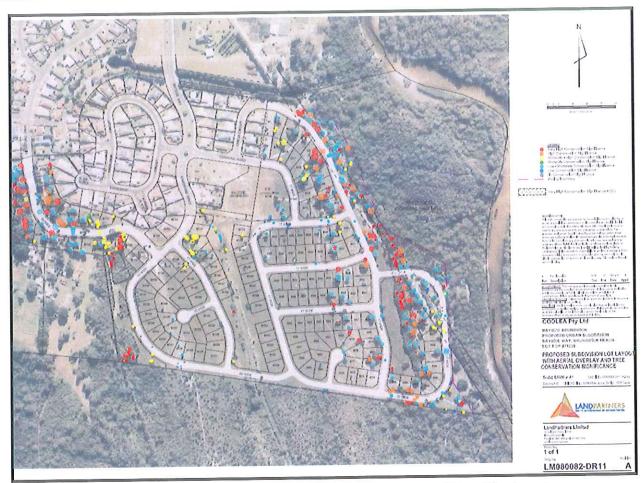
Final Proposed Layout Plans (image courtesy of LandPartners)
